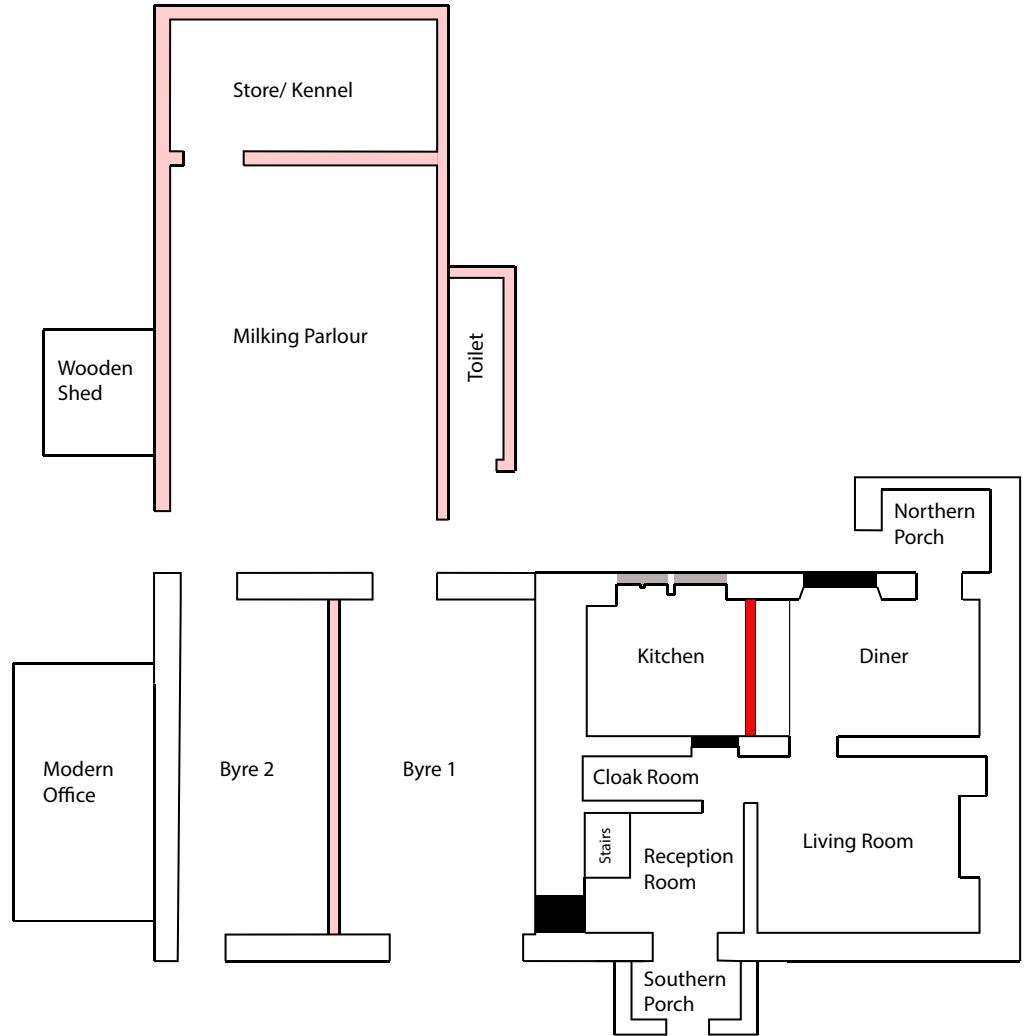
Ground floor plan of Grundy's Farm, Clover Road, Chorley. Scale 1:150 at A4.
